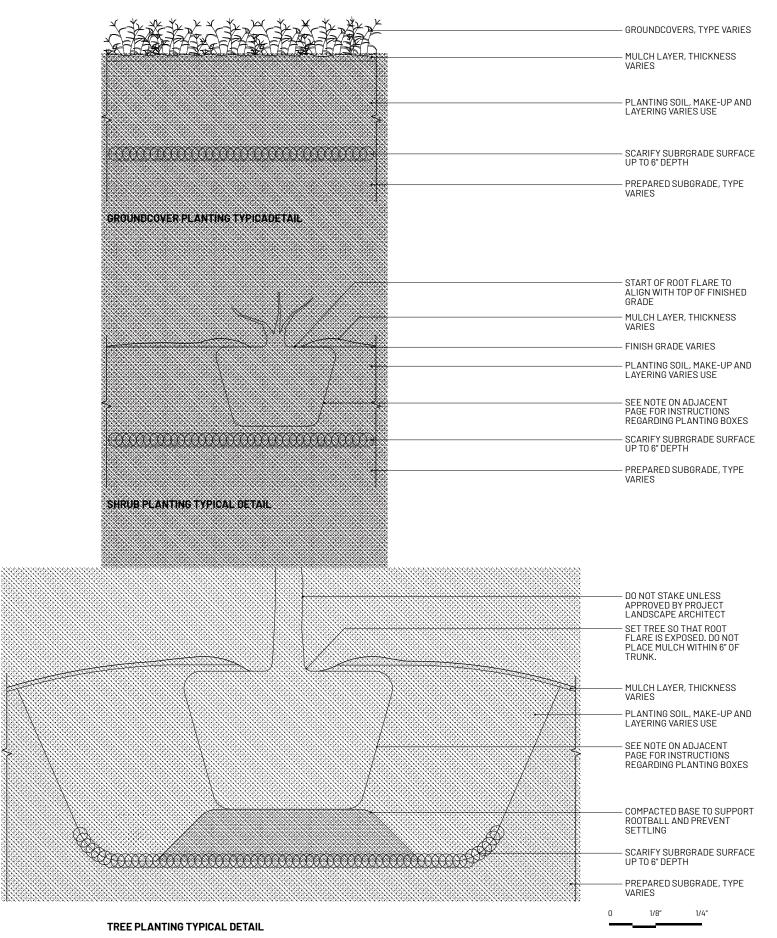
Planting installation methods should include scarifying the subgrade, aligning all root flares with the finished grade, and providing a compacted base for rootballs to provide the best growing conditions and allow the planted media to have the best chance of success.
